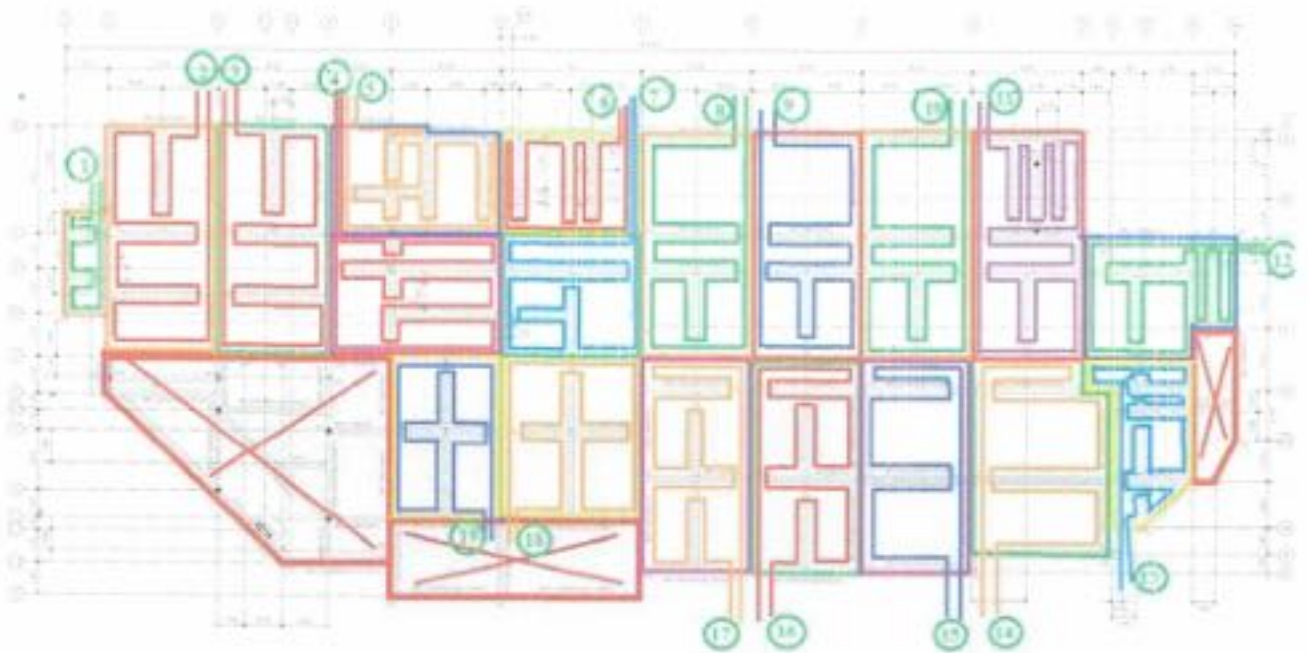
Main floor plan showing the layout of HDPE pipes for the building's protection and pollution control system.
